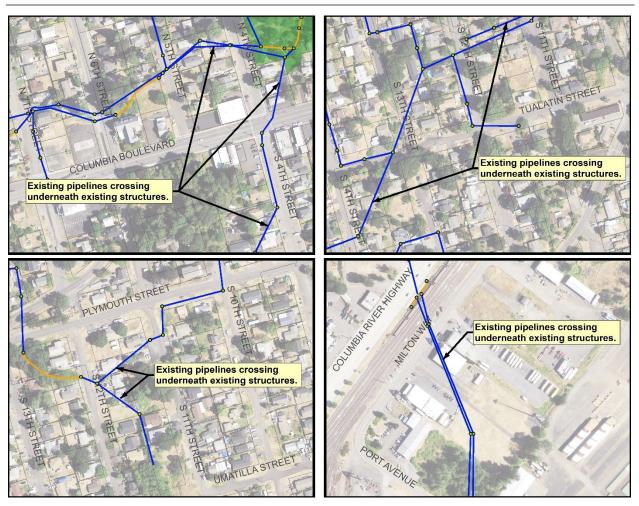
EXISTING PIPELINES CROSSING UNDERNEATH STRUCTURES
